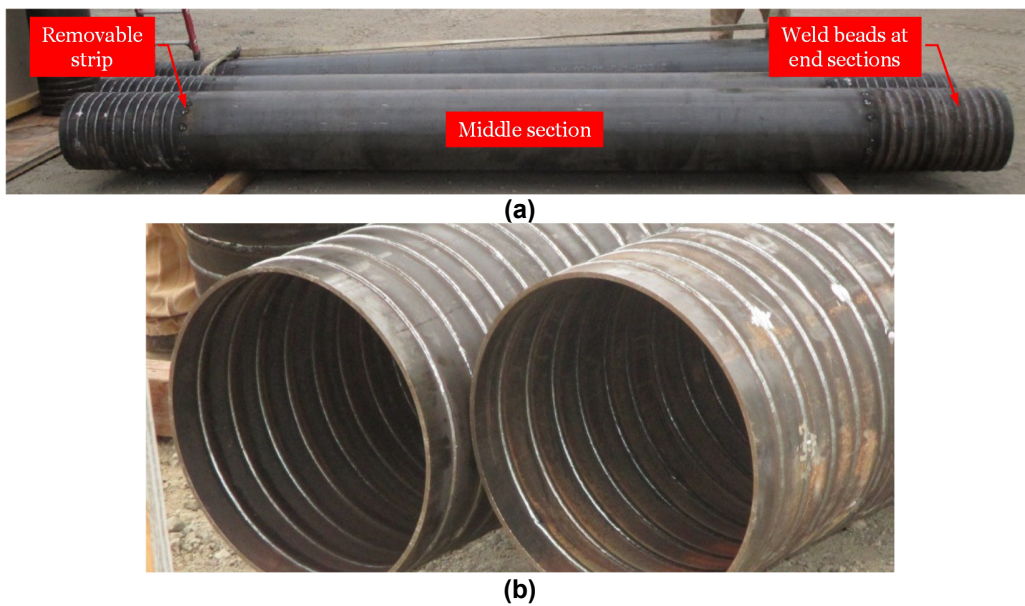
(a) Column steel shells; (b) details of weld beads at column ends.
